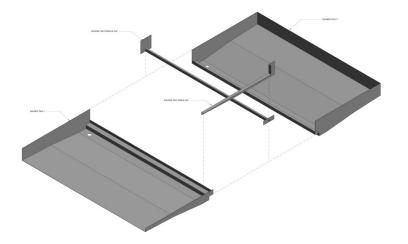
Individual custom-formed stainless steel floor components necessary for waterproofing the bathroom
